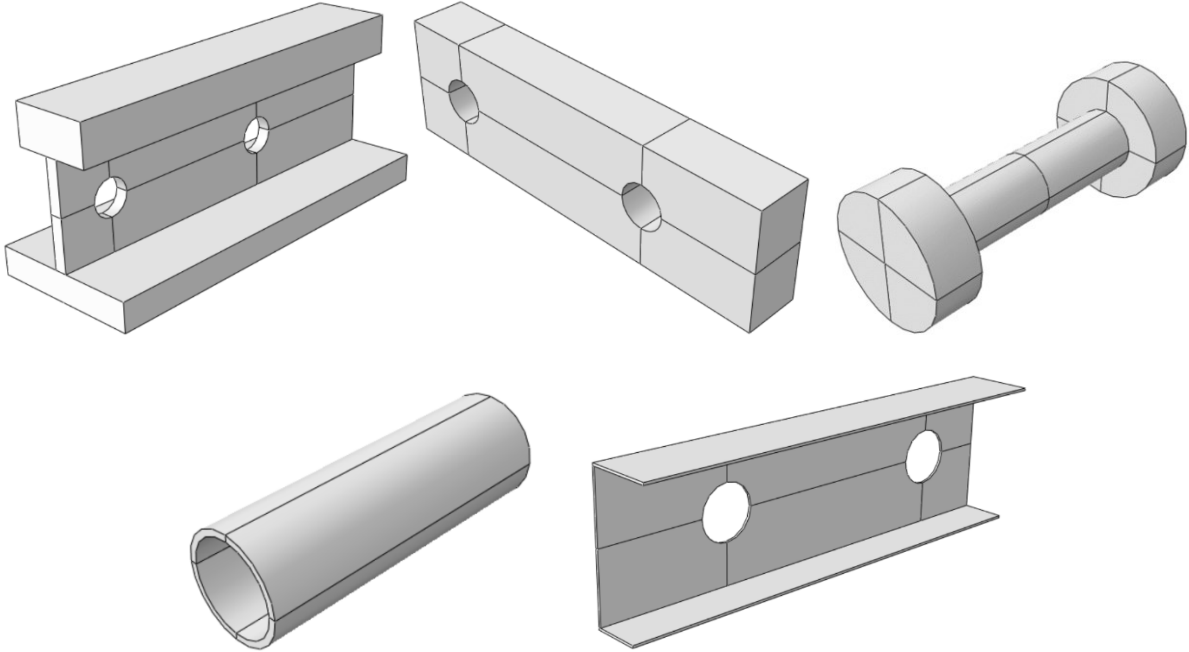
Evolved FEM model with insulating layer and bolt sleeve
